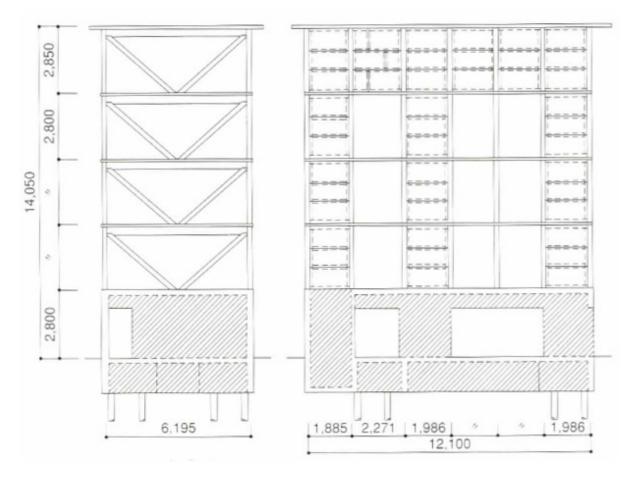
k – Section longitudinal and lateral; Dimensions in [mm]
